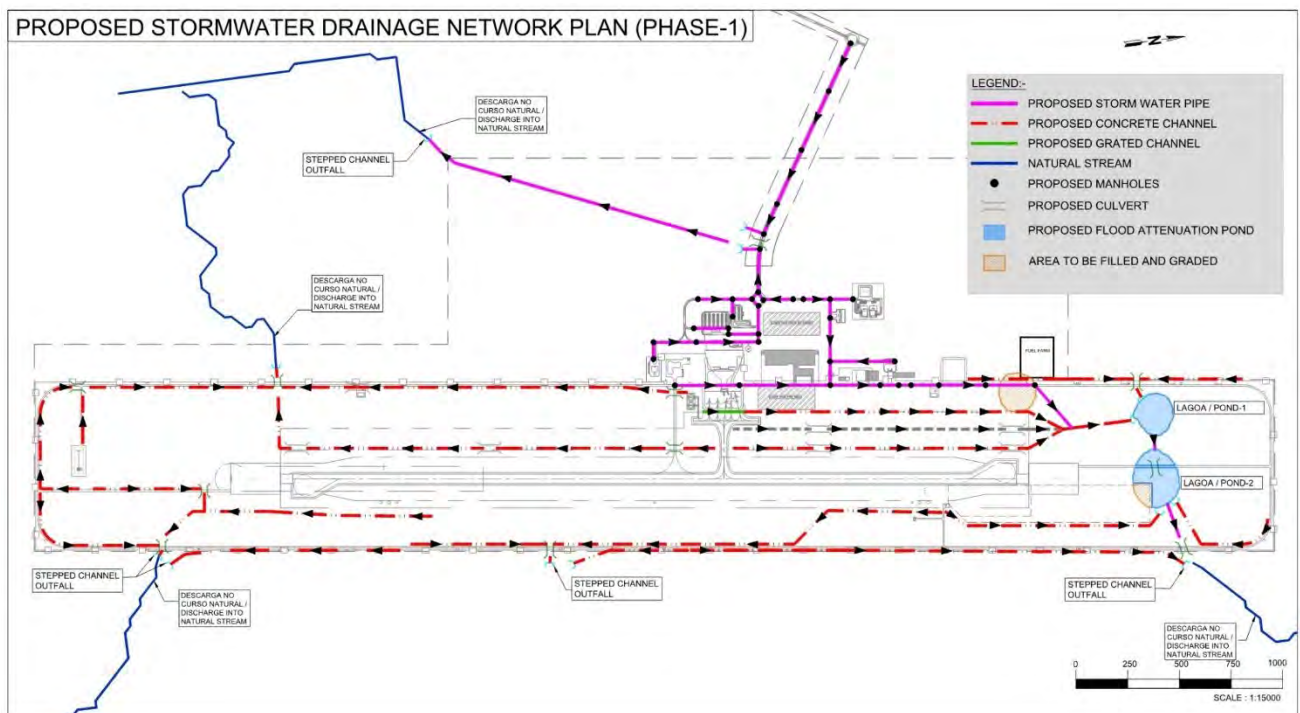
Proposed stormwater system (Phase-1) at NAIC
